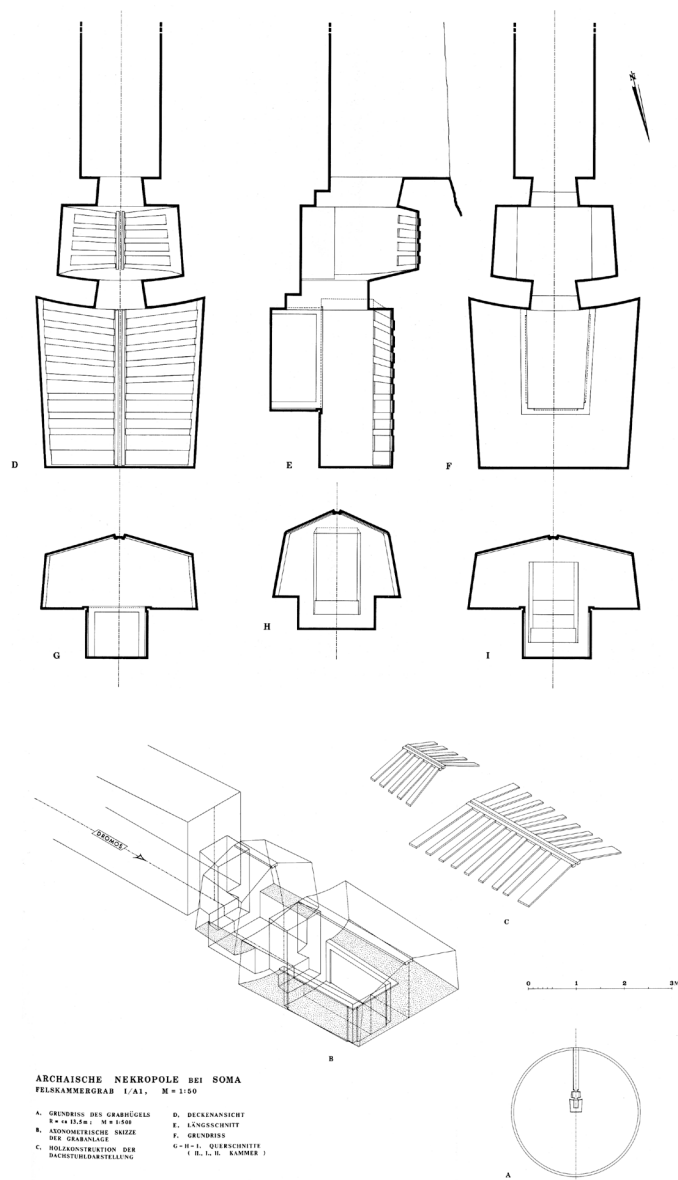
Plans, elevation, sections, and isometric reconstruction of rock-cut chamber tomb A1 at Beyce.
